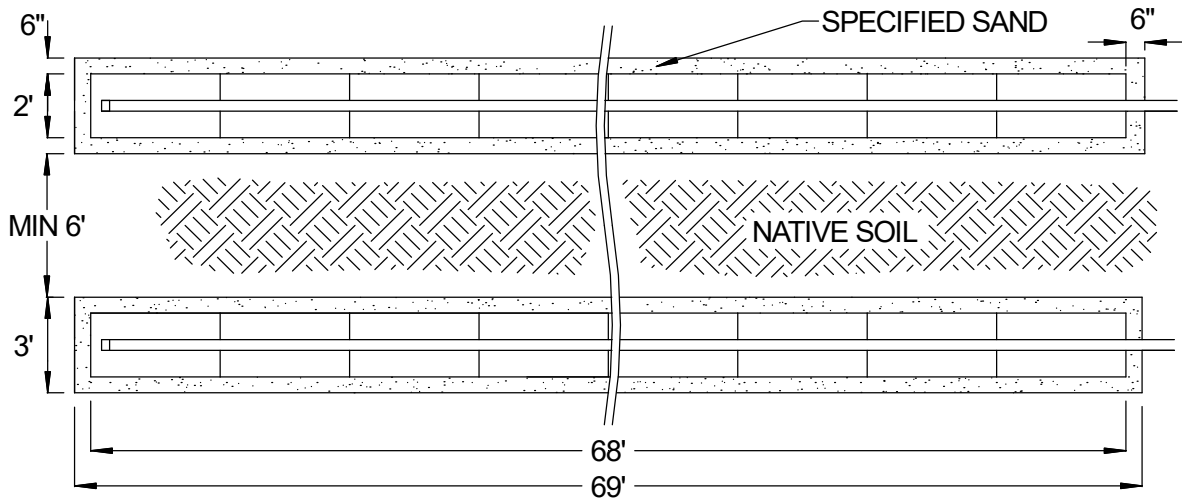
SECTION VIEW – TRENCH SYSTEM – LEVEL SITE
